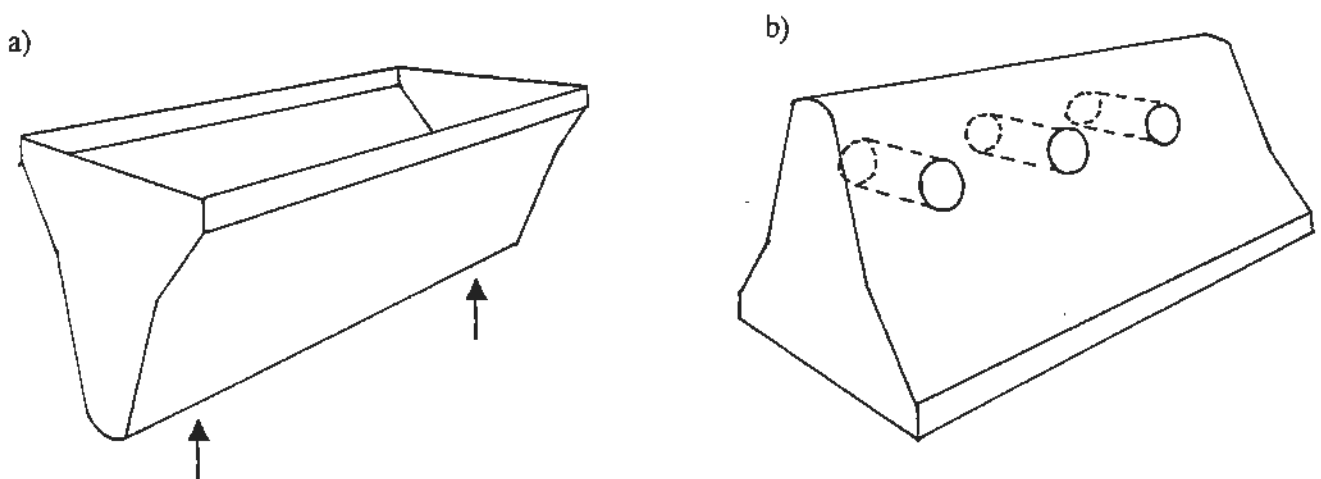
Production of concrete safety barriers, and cores for testing concrete
